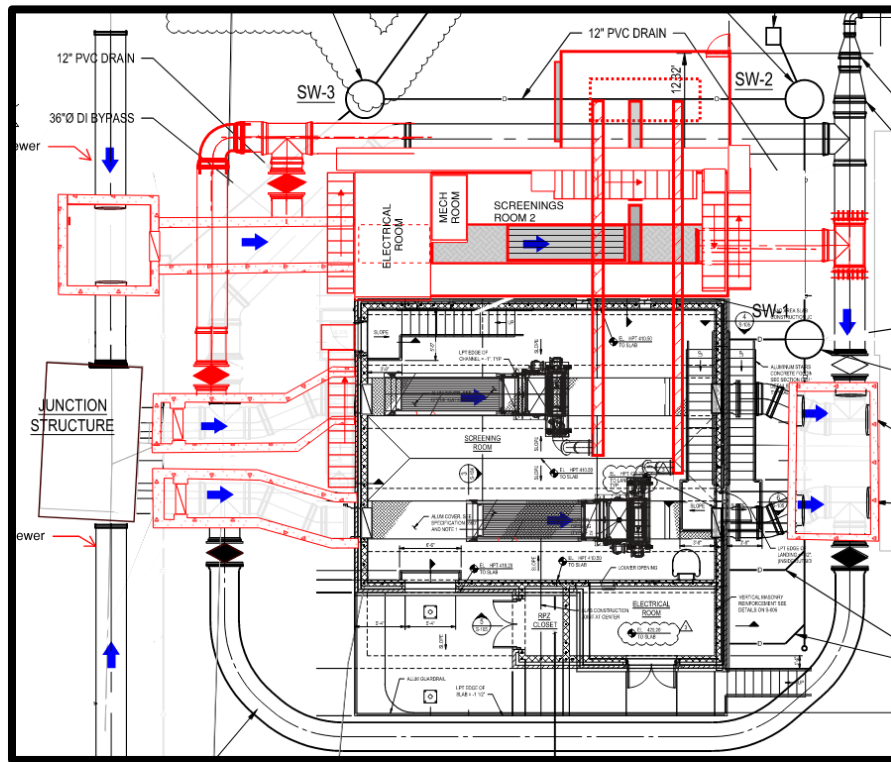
Alternative 2 - Screening Building Expansion to the North
